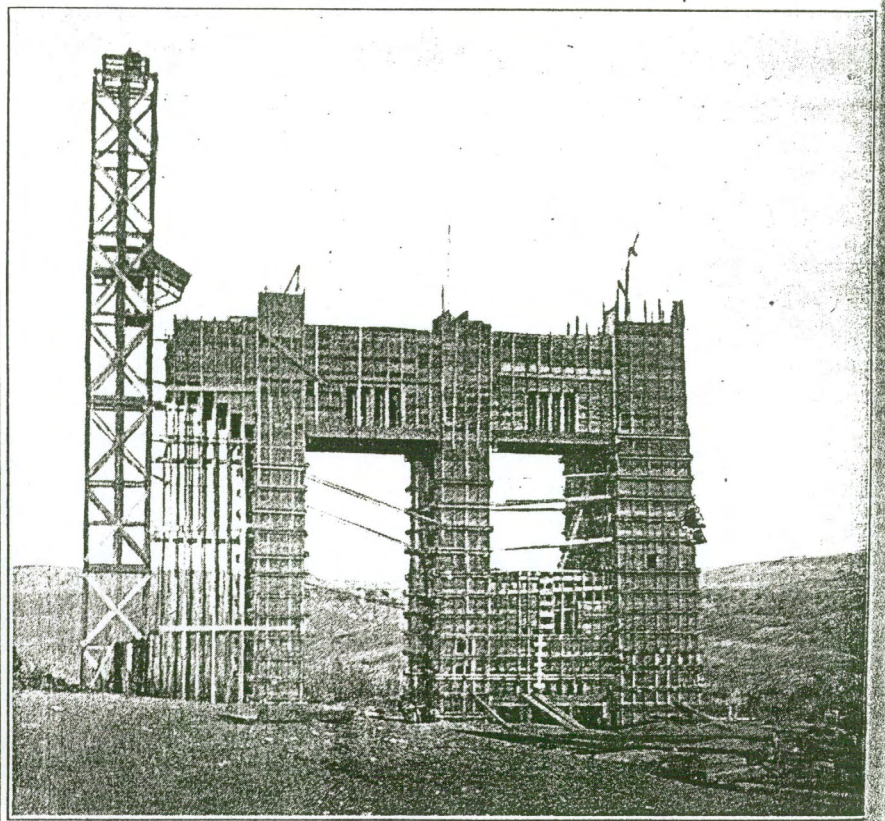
West Abutment of Judith River Viaduct. Looking North.
